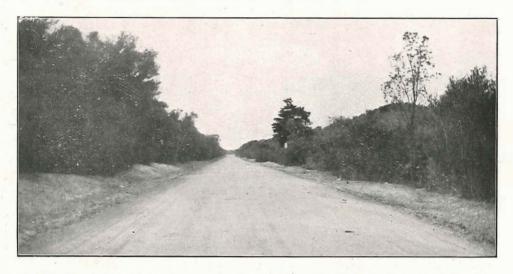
Showing excellent road surface of Macadam obtained by efficient rolling with steam roller, Shire of Frankston and Hastings.
